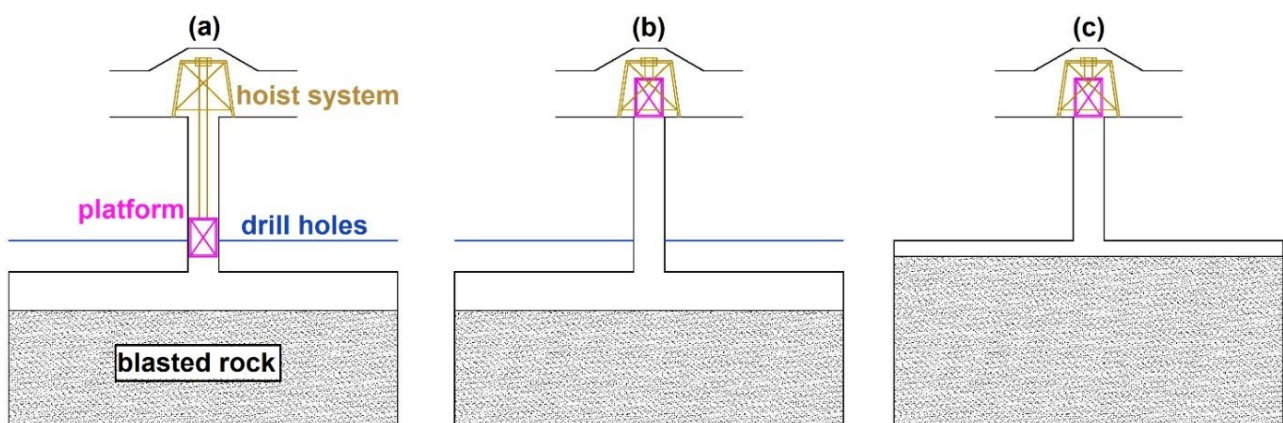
Schematic overview of drilling and blasting work in a raise: (a) drilling and loading of boreholes, (b) platform lifted to top for blasting, (c) freshly blasted roof. Details of machineries are not shown. The schematic drawing shows a horizontal roof. In practice the actual roof will be an open cone the angle of which will be determined by blasting and roof stability considerations.
